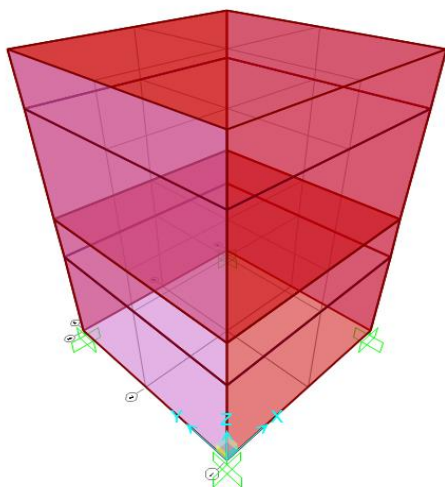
Double storey Lintel banded masonry house prepared in SAP-2000.
